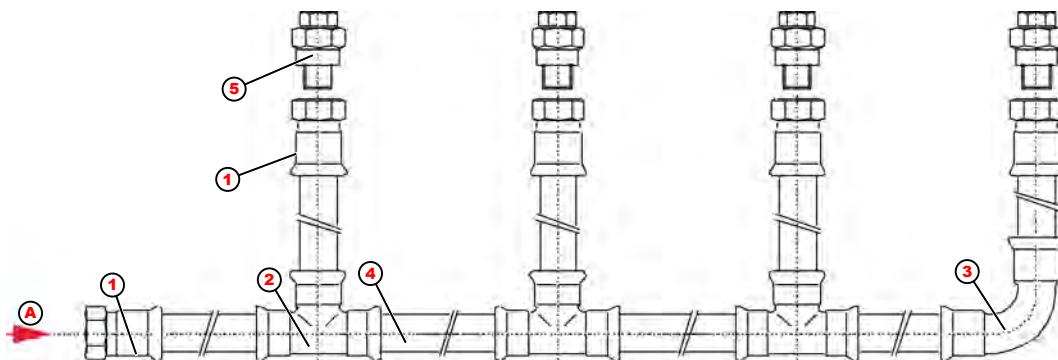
Connection assembly with screw connection coupling for 1-4 units
